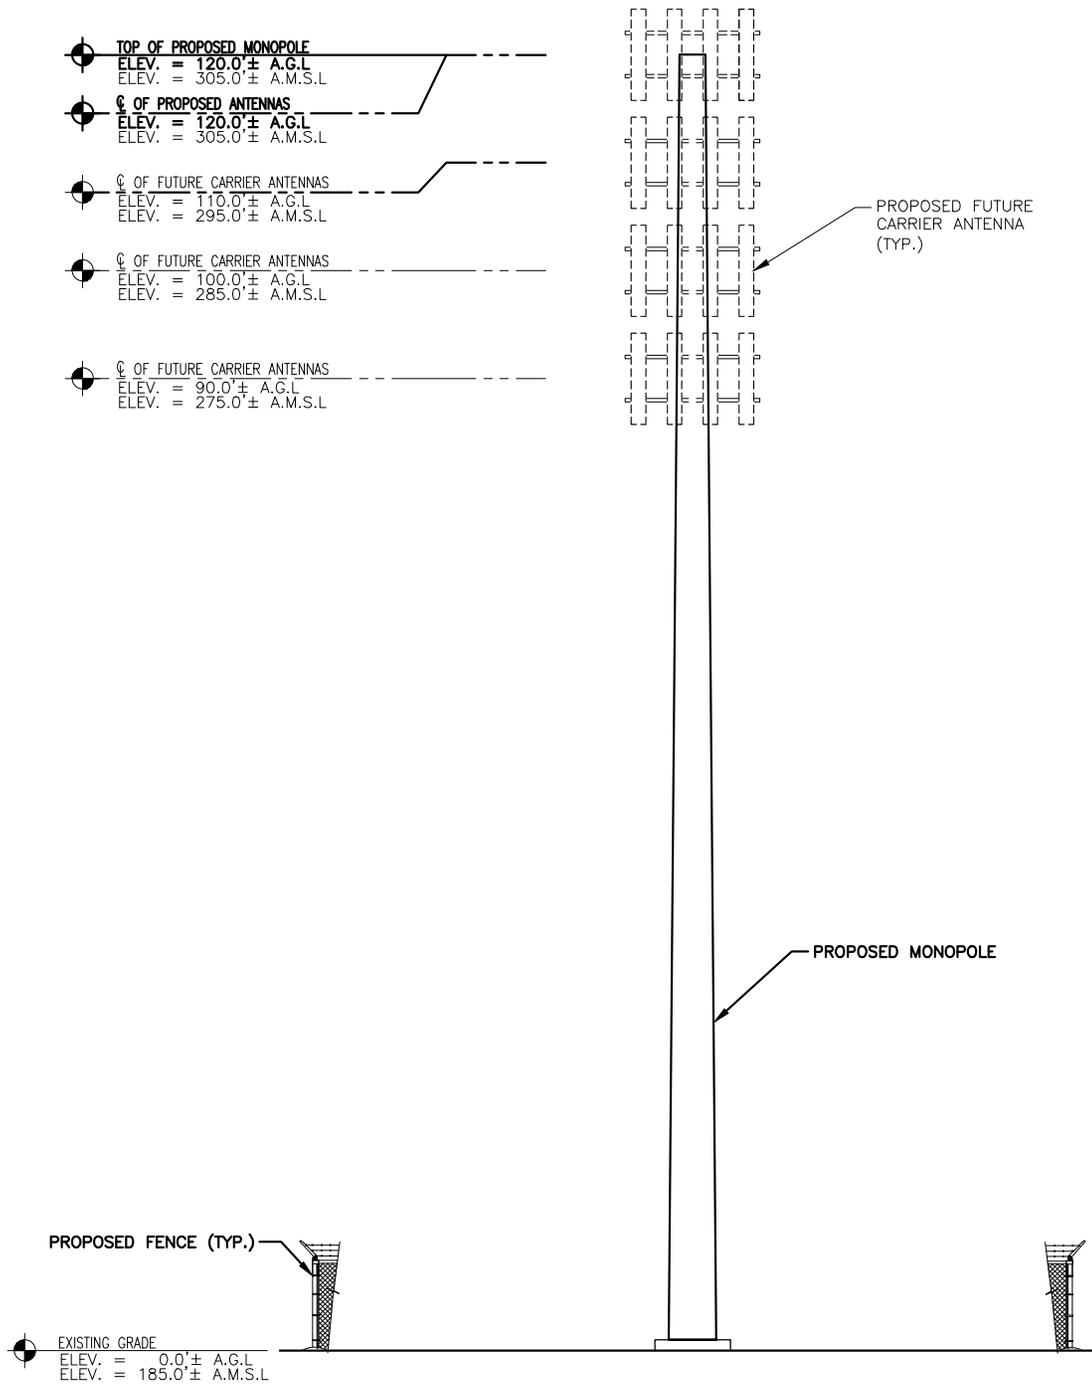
PROPOSED EQUIPMENT ELEVATION PLAN
